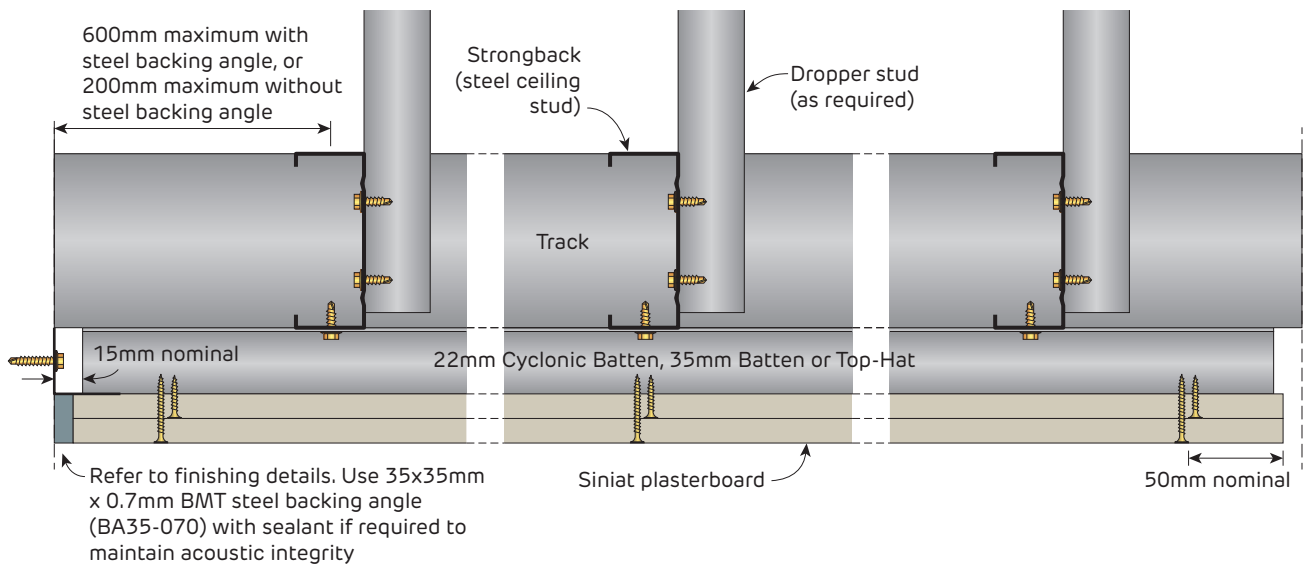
Stud Ceiling Type C2 - 2-way Plenum Braced
